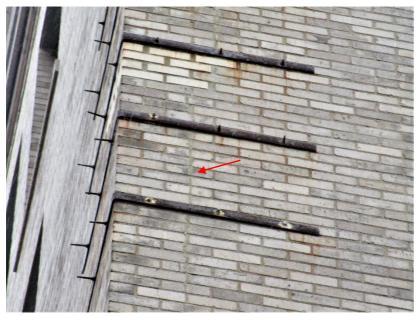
Corrosion at steel reinforcement straps and fasteners. Also note crack filled with elastomeric sealant.
